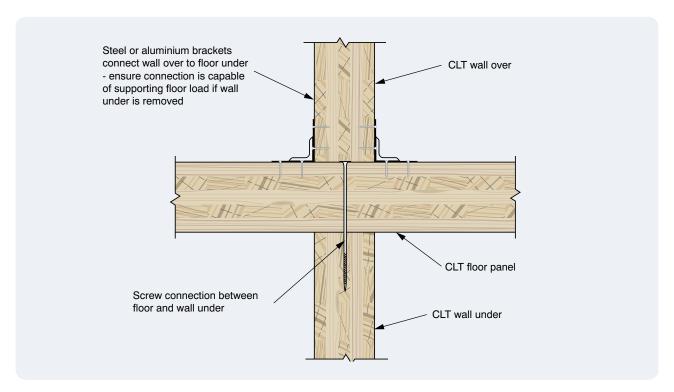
Typical wall-to-floor connection in a CLT building. (from WoodSolutions Technical Design Guide #39 Robustness in Structures)
